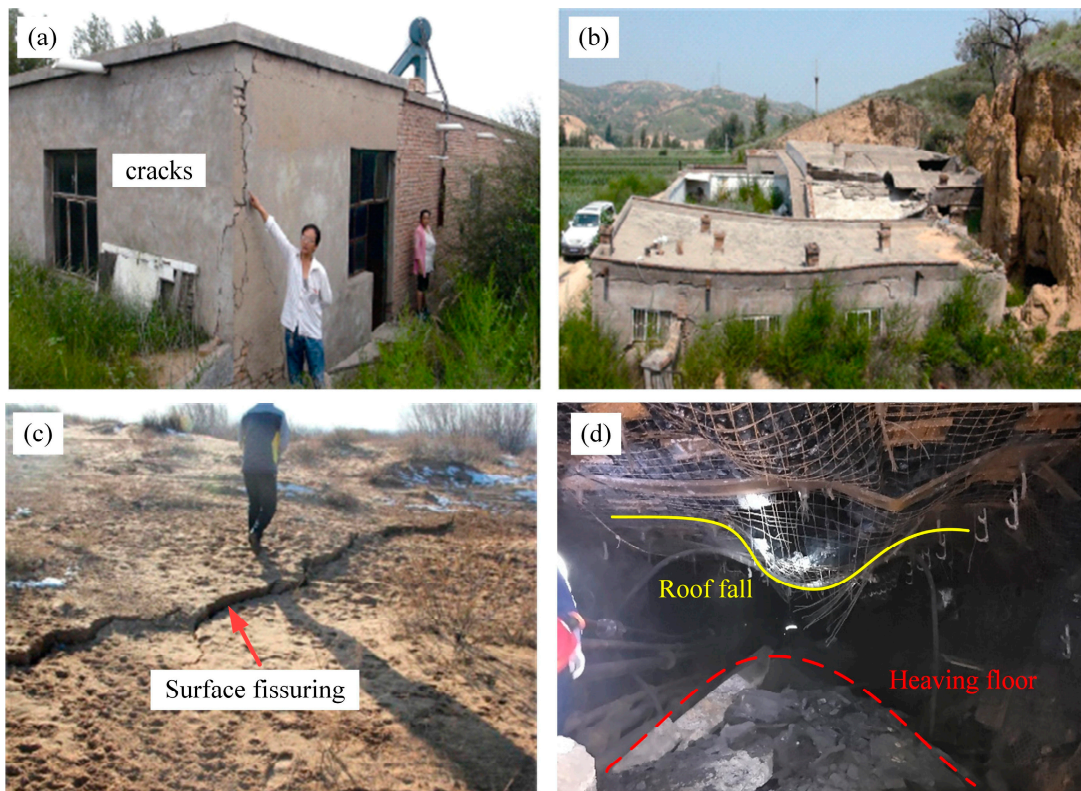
Damage caused by mine tremors on the surface and underground: (a,b) cracking and deformation of buildings [10]; (c) surface fractures; and (d) underground coalburst damage.
